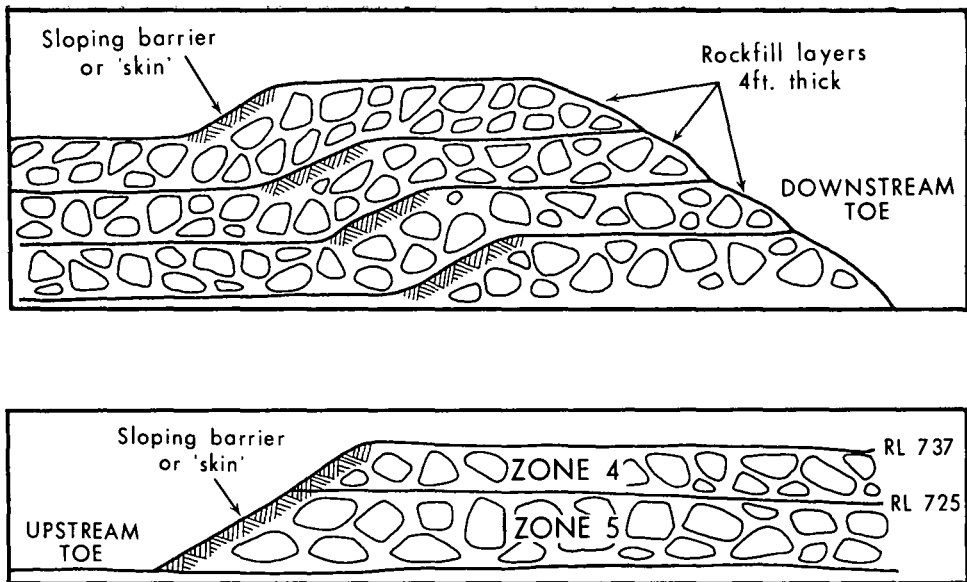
Sloping barriers or "skins" developed on zone 4 and zone 5.
